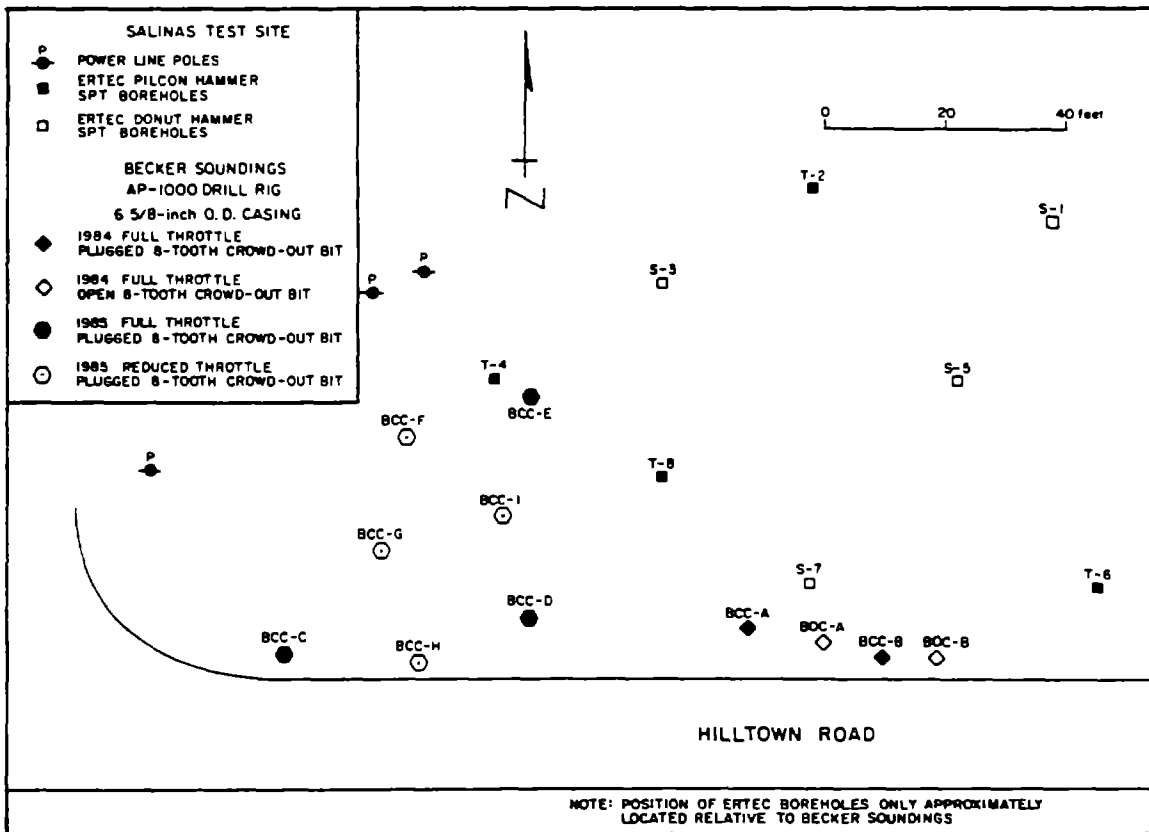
GENERAL LAYOUT OF BORINGS AND SOUNDINGS AT SALINAS TEST SITE
